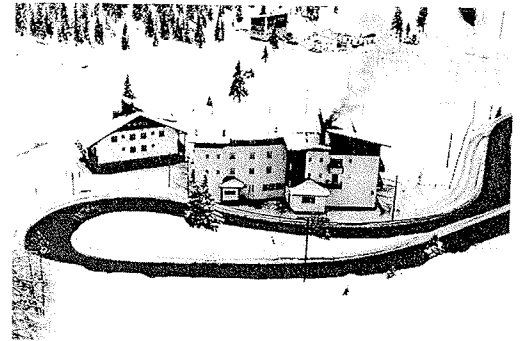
Road at Plan de Gralba after application of CaCl_2 solution.
